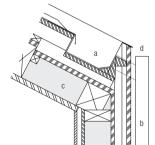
Close-up of window The ventilation flap and roller blind are behind the fascia panel at the top.
